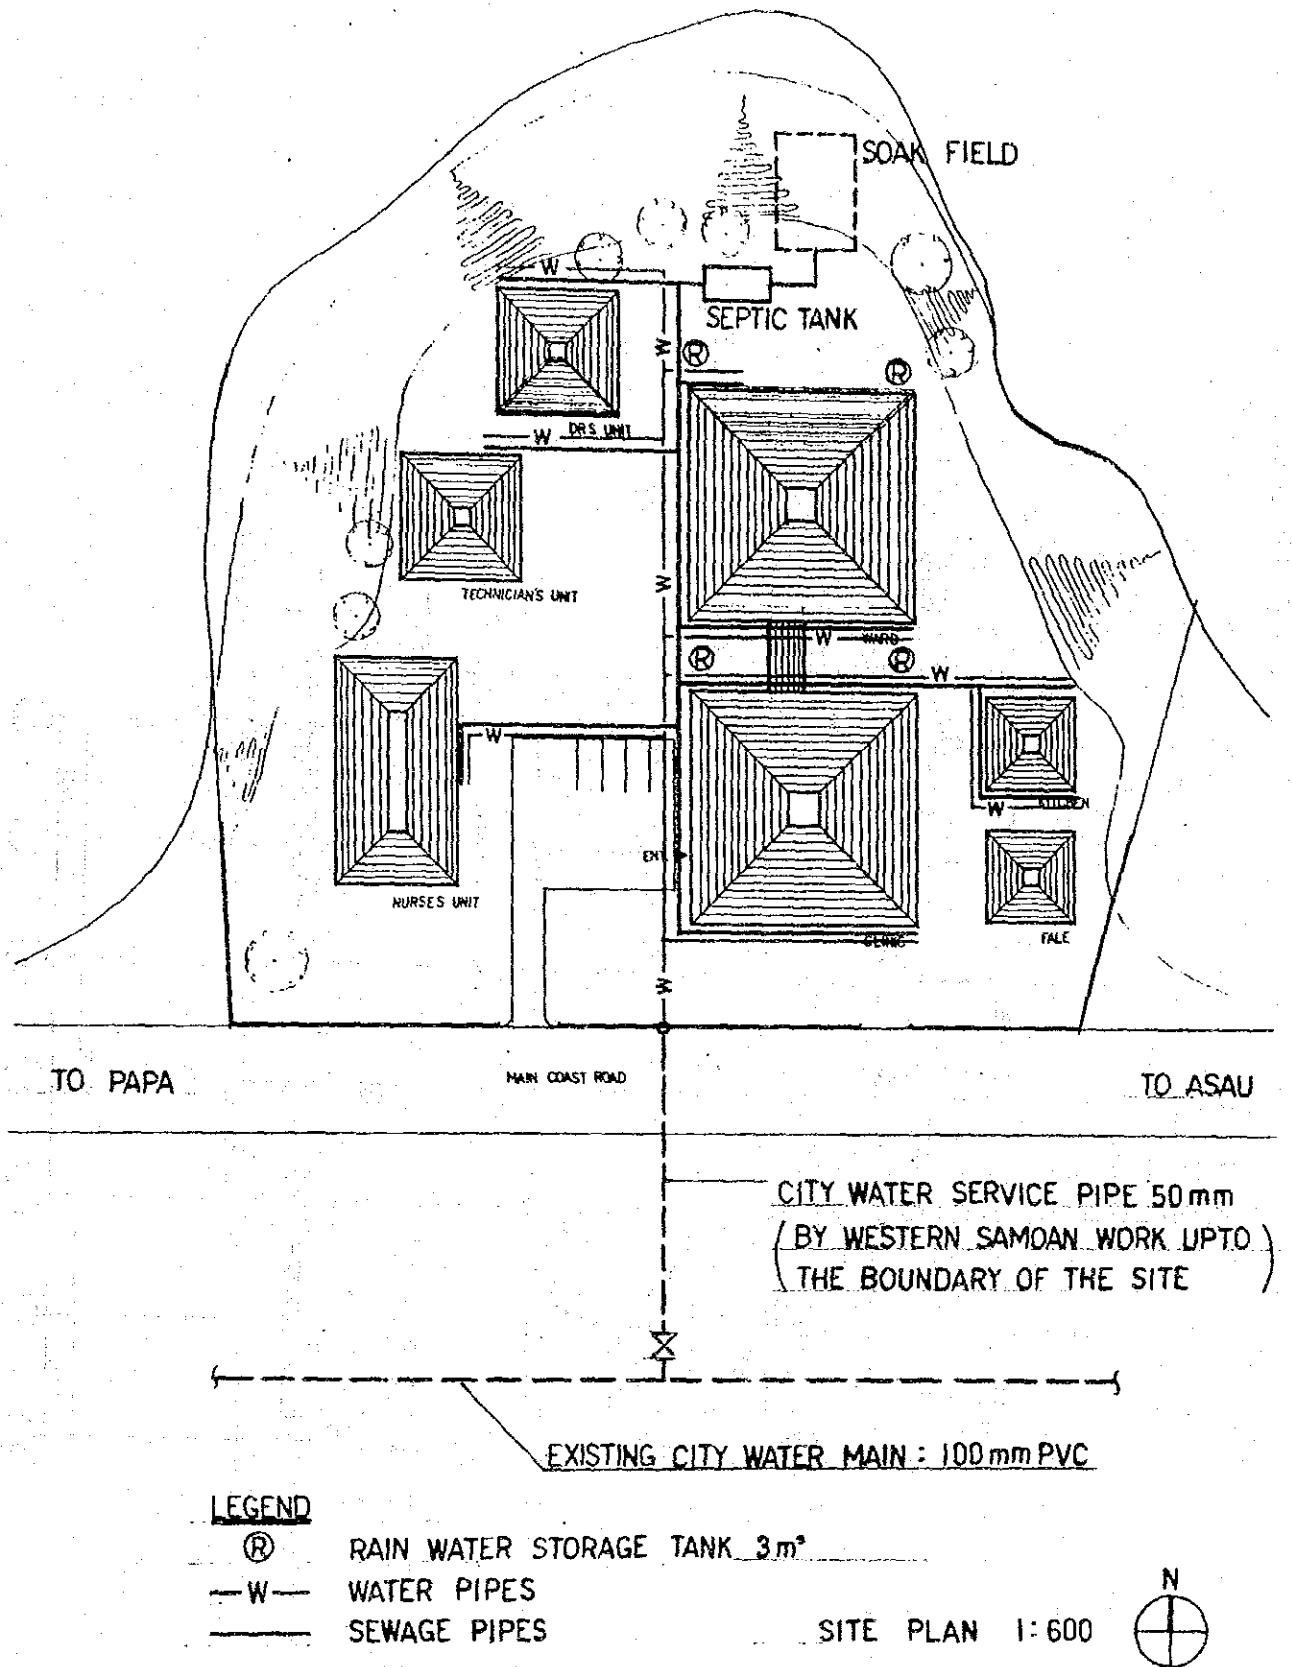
(b) PLUMBING LAYOUT IN
